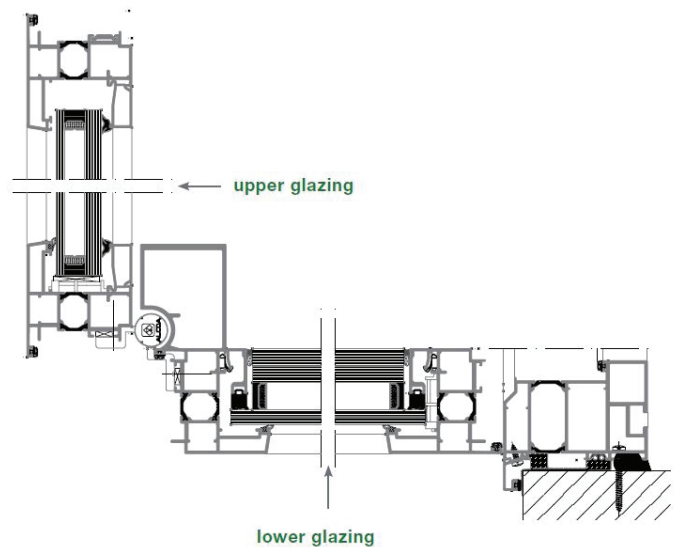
detail glassfloor (Bloomframe, 2019)
